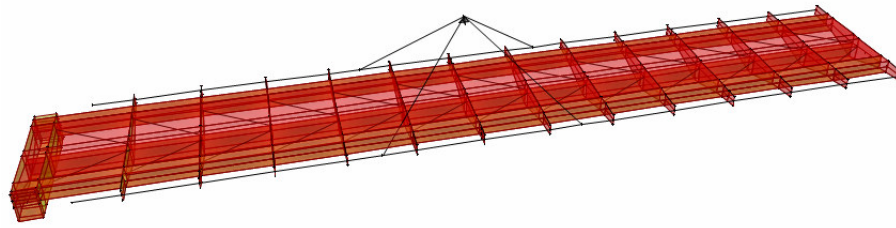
3-D view of one the bridge deck segment FE model for lifting process
